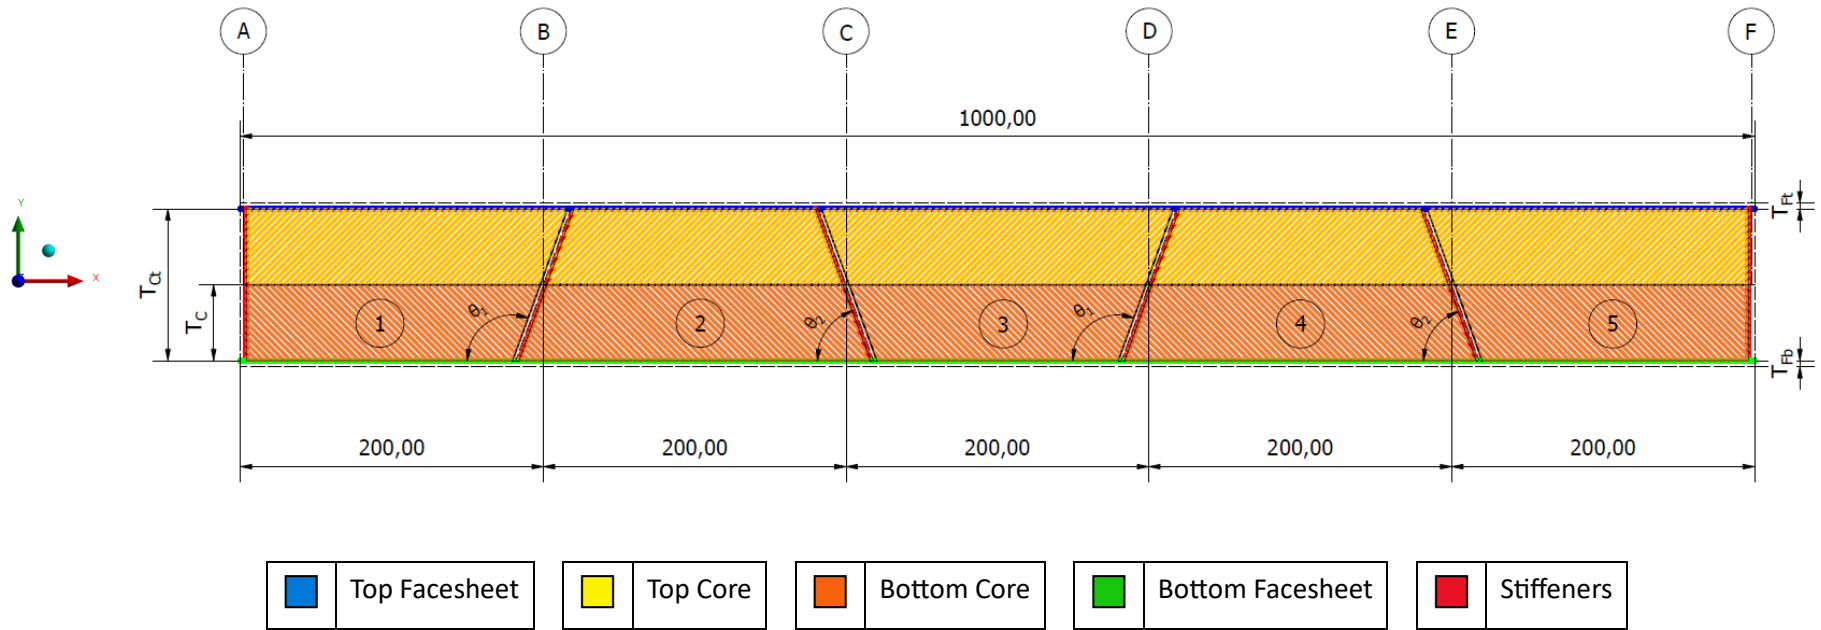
Geometry of GFRP sandwich panel was comprised of 5 independent sketches; top facesheet; top core, bottom core; bottom facesheet and, stiffening system. Note that dimensions are in mm
